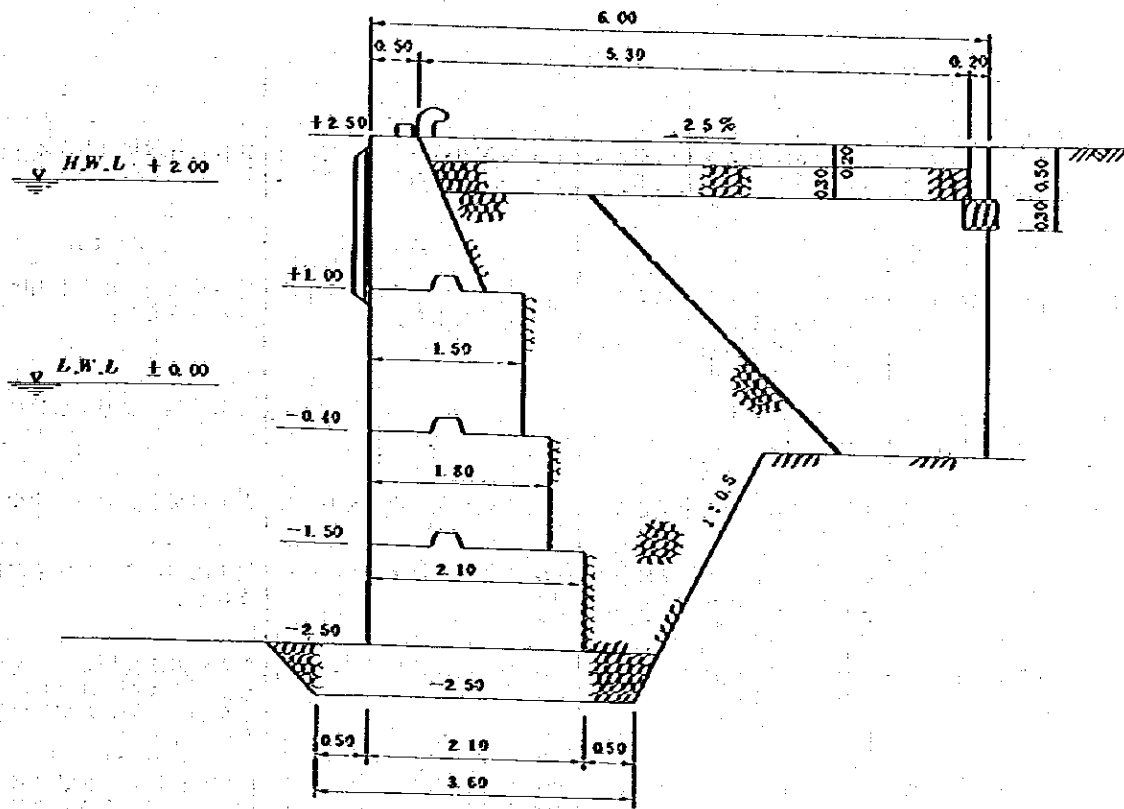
Standard Cross Section of Wharf - 2.5 M
